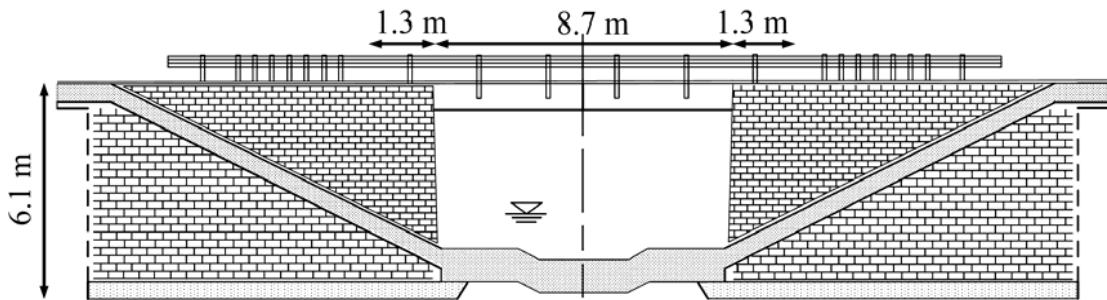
General cross-section view of the GRS-IBS structure, along the road centerline
